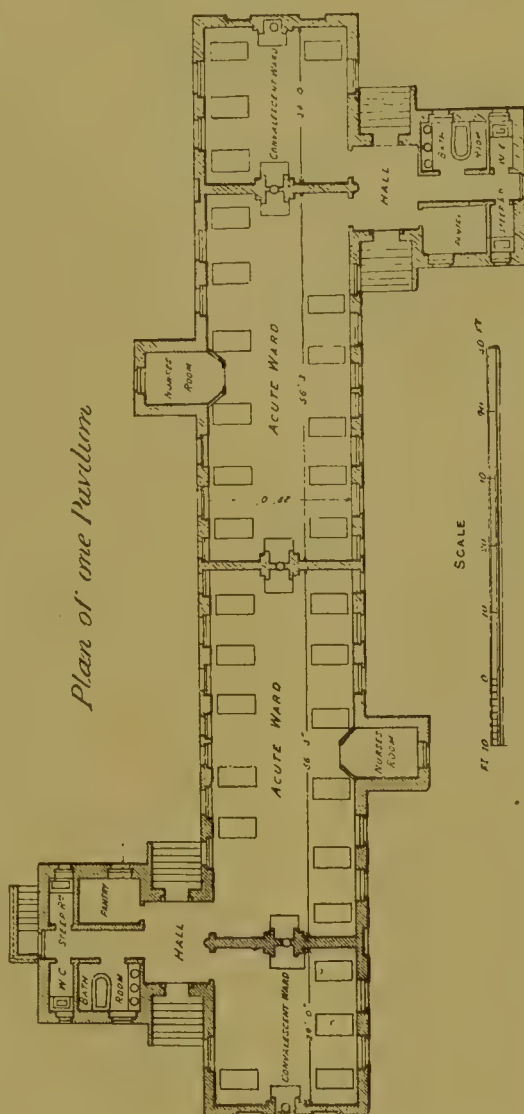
Ground Plan of a Pavilion in Belvidere Hospital.
